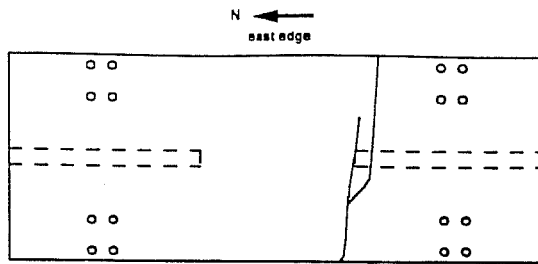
Sp. 2b: Progression of Cracking of Top Face of Roof Slab at Load Point 67
